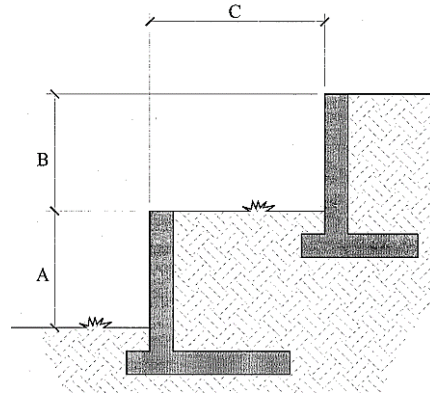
Geometric elements of Stacked Retaining Walls, (Weight, 2008)
